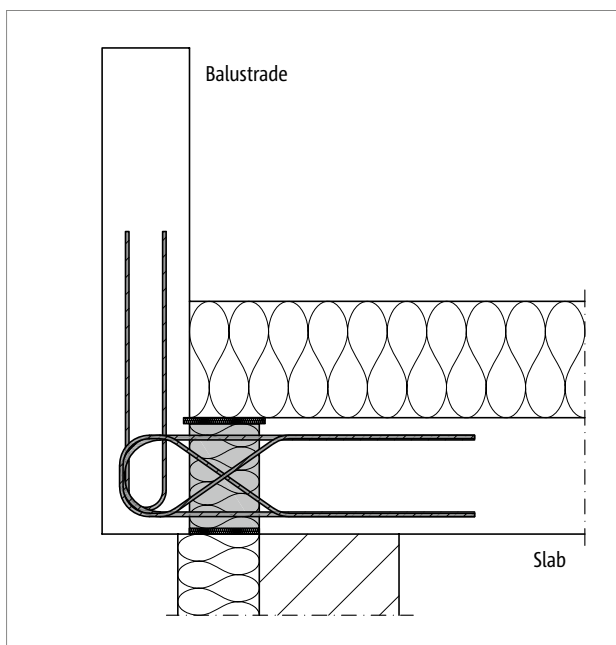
Schöck Isokorb® XT type F: Connection to a corbelled sill with thermal insulation composite system (WDVS)
